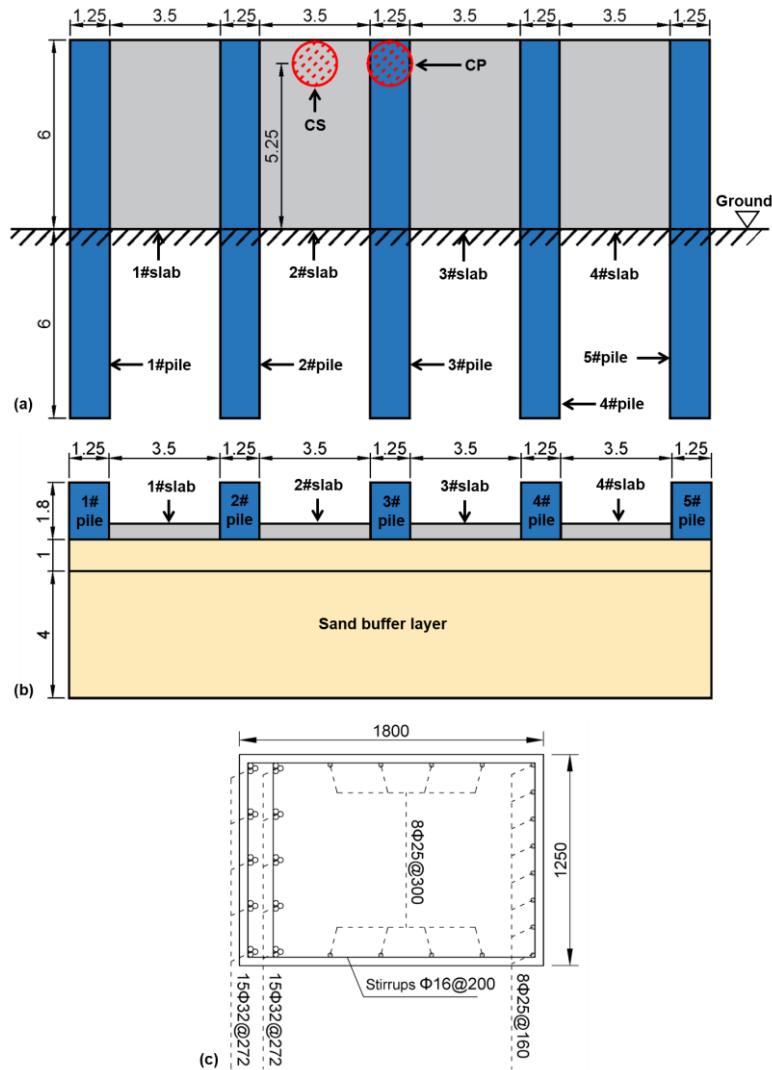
The design diagram of PSRW (a) front view (unit: m) (b) top view (unit: m) (c) cross-section profile of pile (unit: mm).
